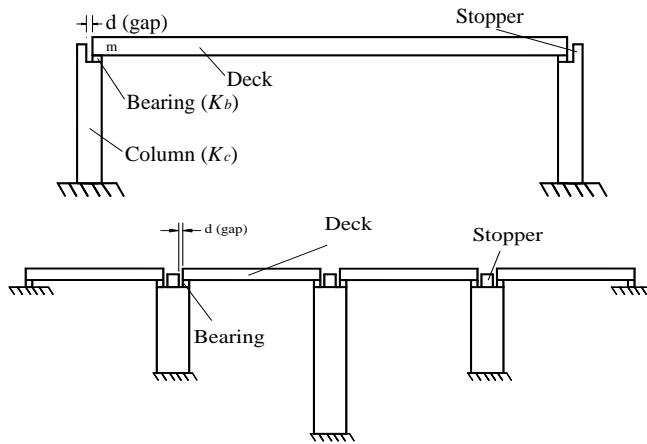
Schematic diagram of (a) single span bridge and (b) multi span bridge
